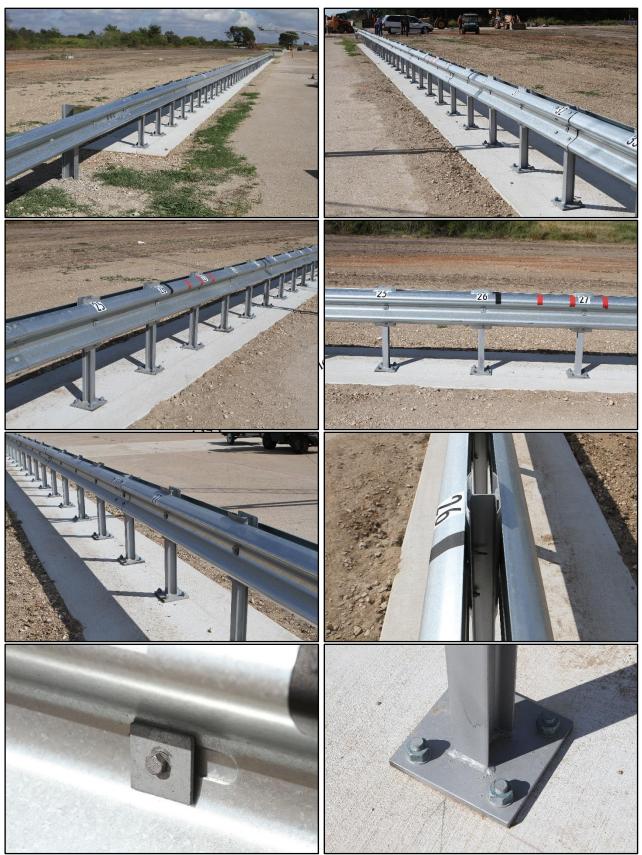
Surface- Mounted Median Guardrail prior to Testing.
